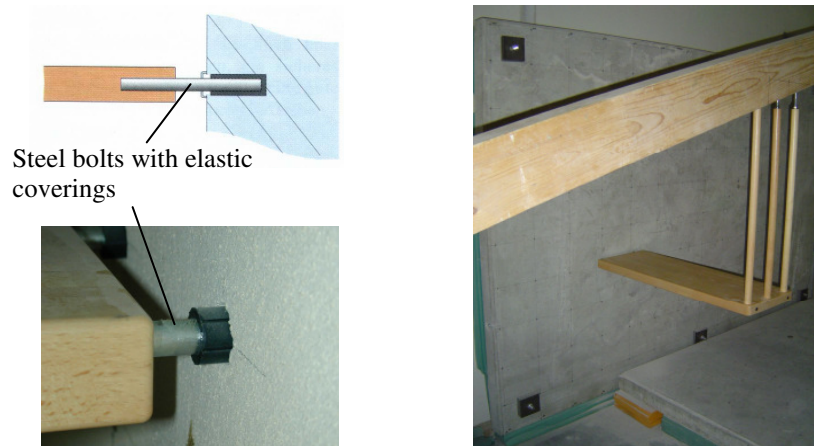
Mounting detail (left) and step fixed on reception plate (right)
